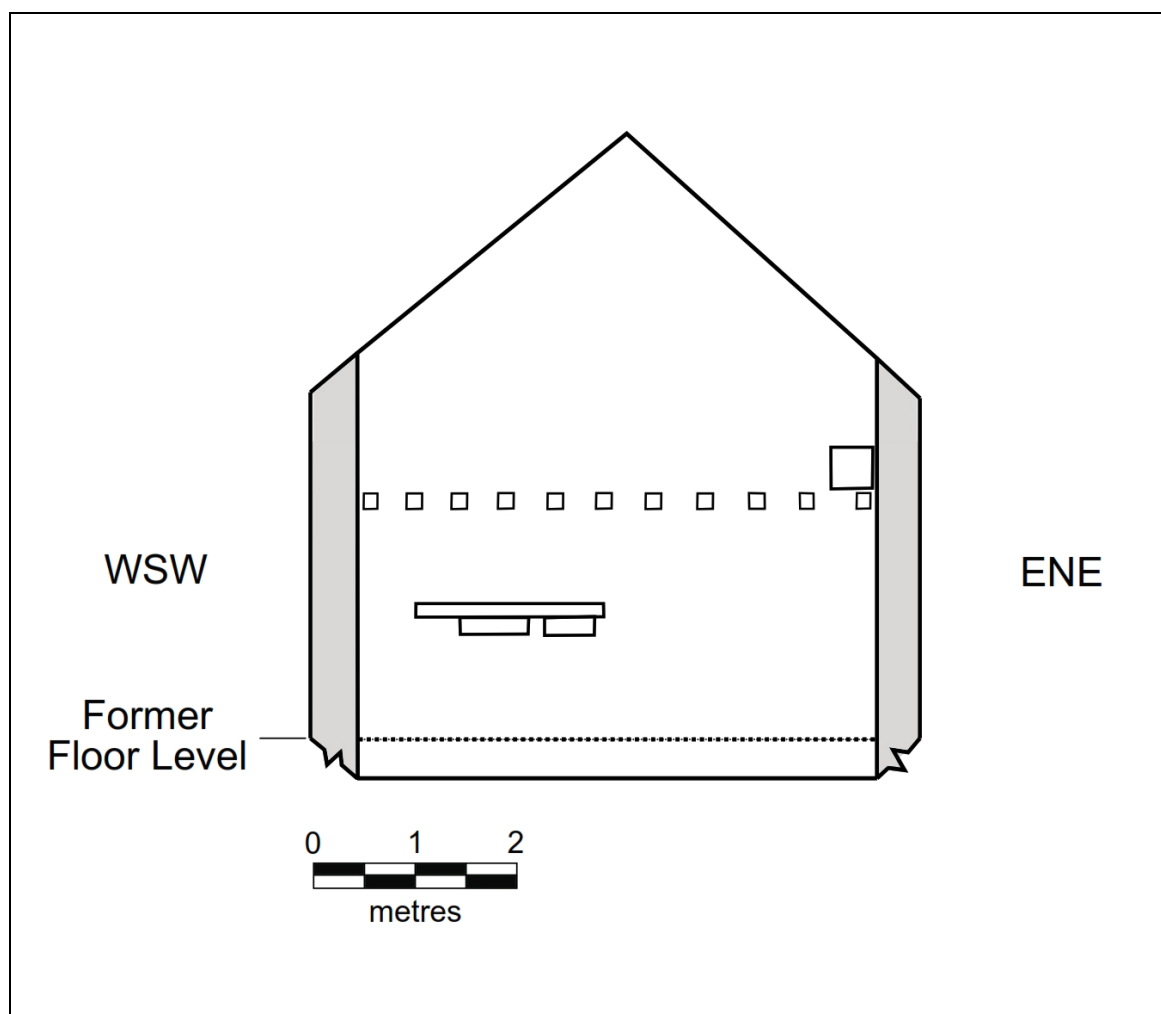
Elevation of inside of north wall inside the southern section of Yew Tree Barn, Defynnog.
